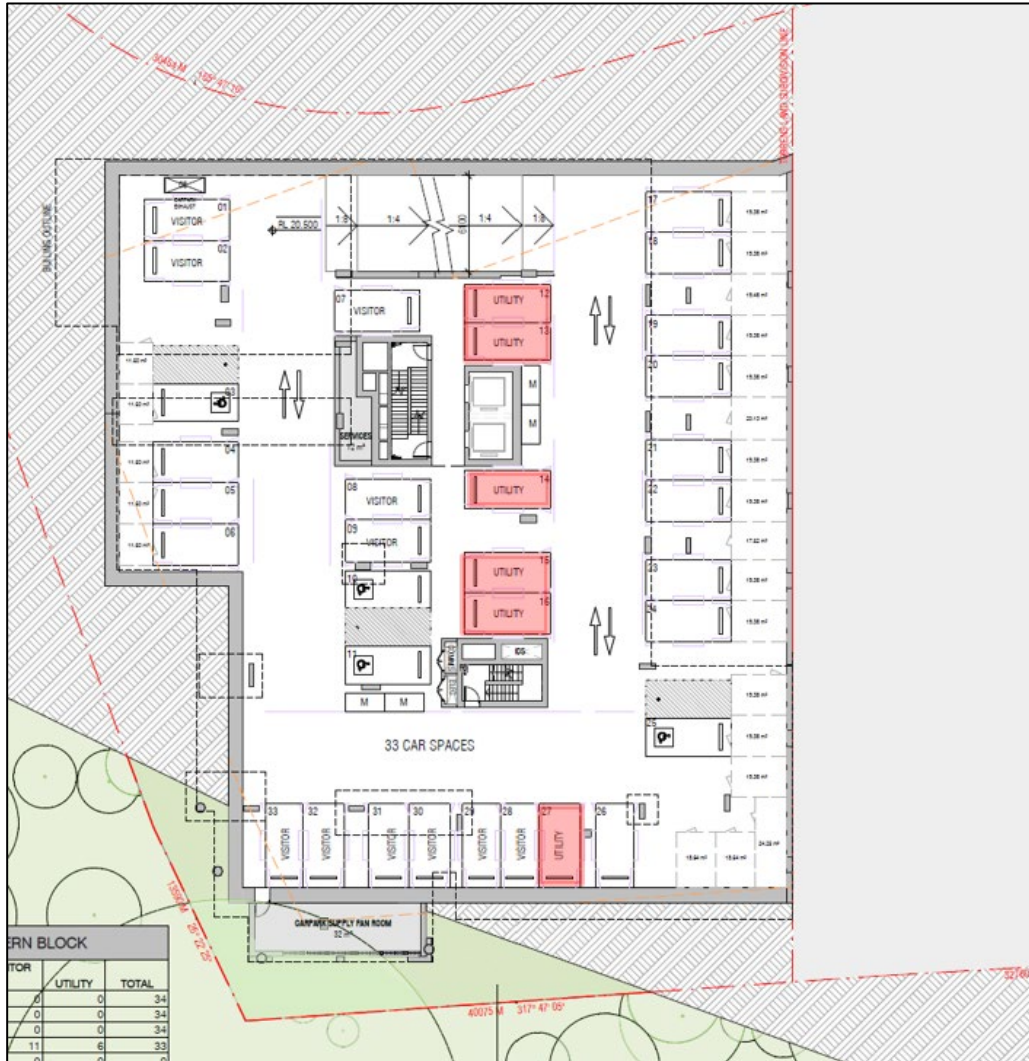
Basement 04 Plan with space around supporting columns highlighted in red.
